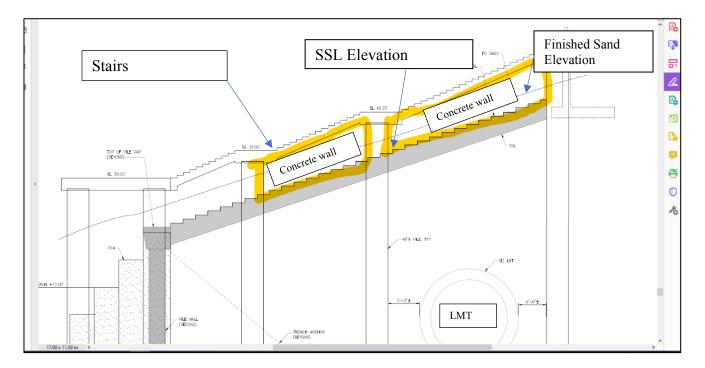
Area for Nesting Habitat Between the Stairs and SSL Shown on Highlighted Side Panels
